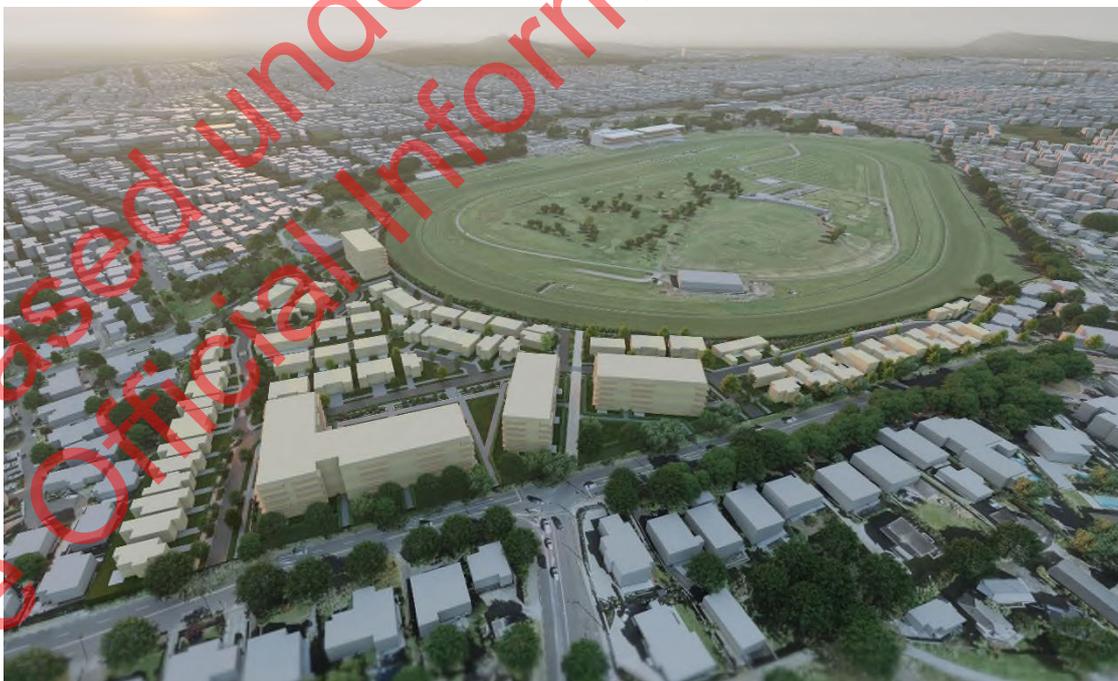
3D Indicative Concept Plan from south-west (sourced from Brewer Davidson)
